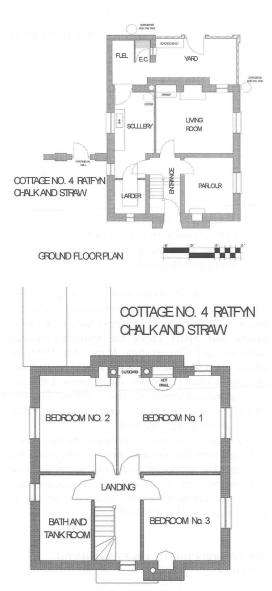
Ground and upper floor plans of no 4 Ratfyn
